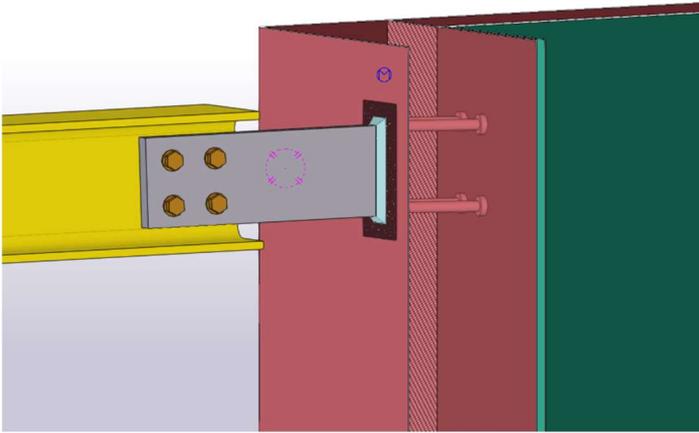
(continued): Shared concrete structural model and sample connection design as a collaborative design task
